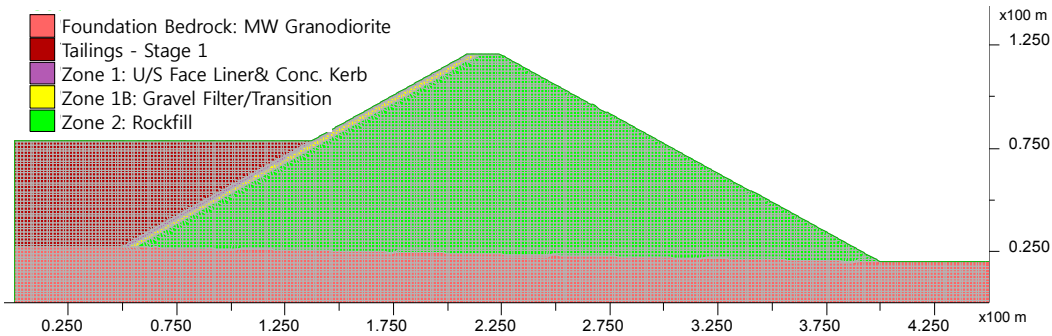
Typical cross section of Dam1 presented as a simplified FLAC mesh.
